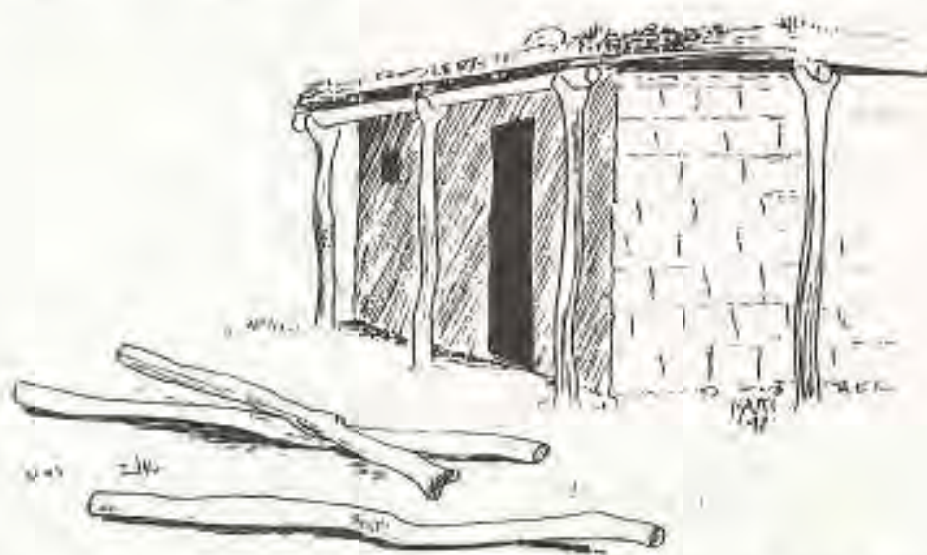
A 'tembe' with mud walls and a few post outside the walls
